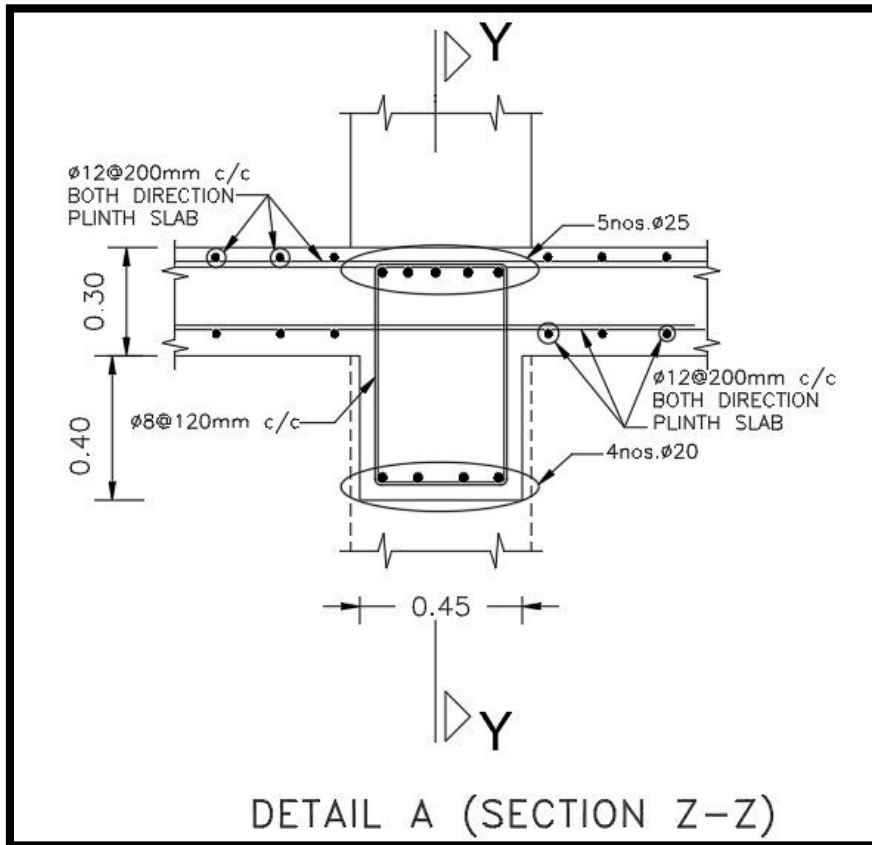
49 Detail A at section Z-Z of crane column and plinth level beam intersection
